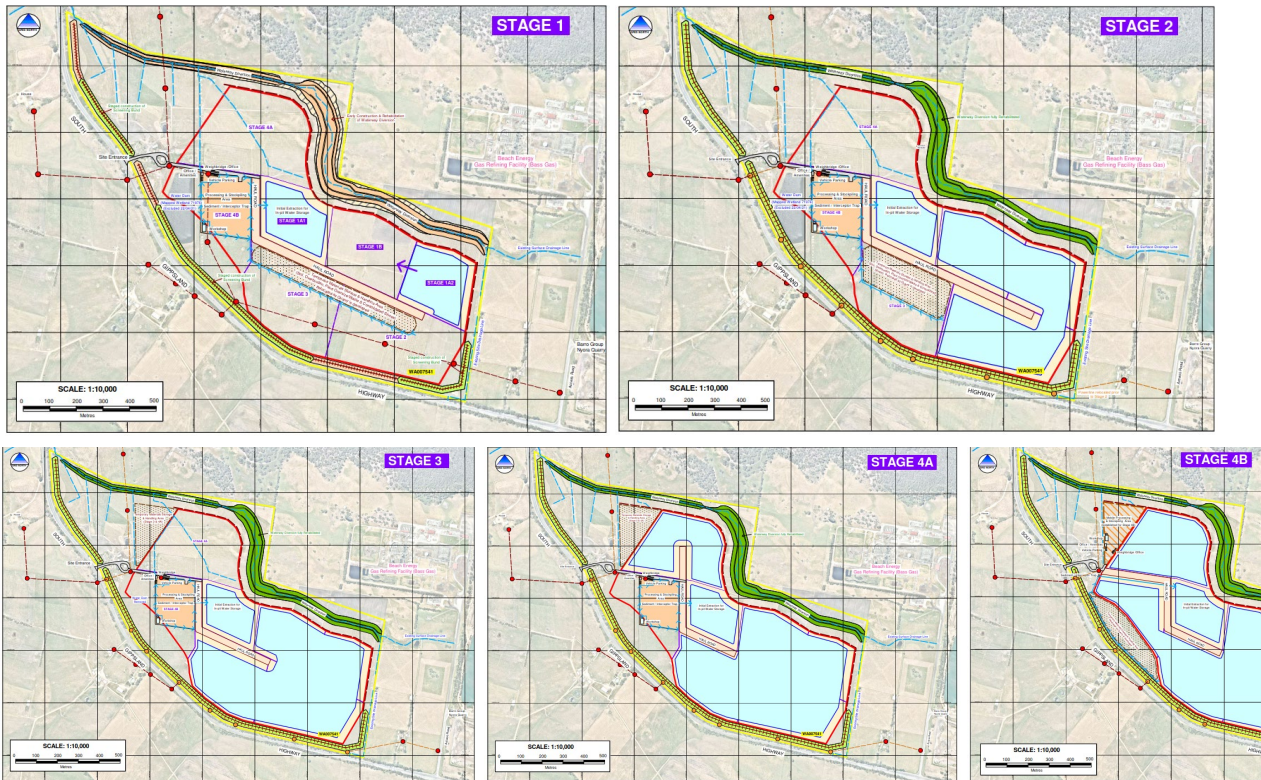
Staging of Site Layout (Source: BCA Consulting, 2023)
